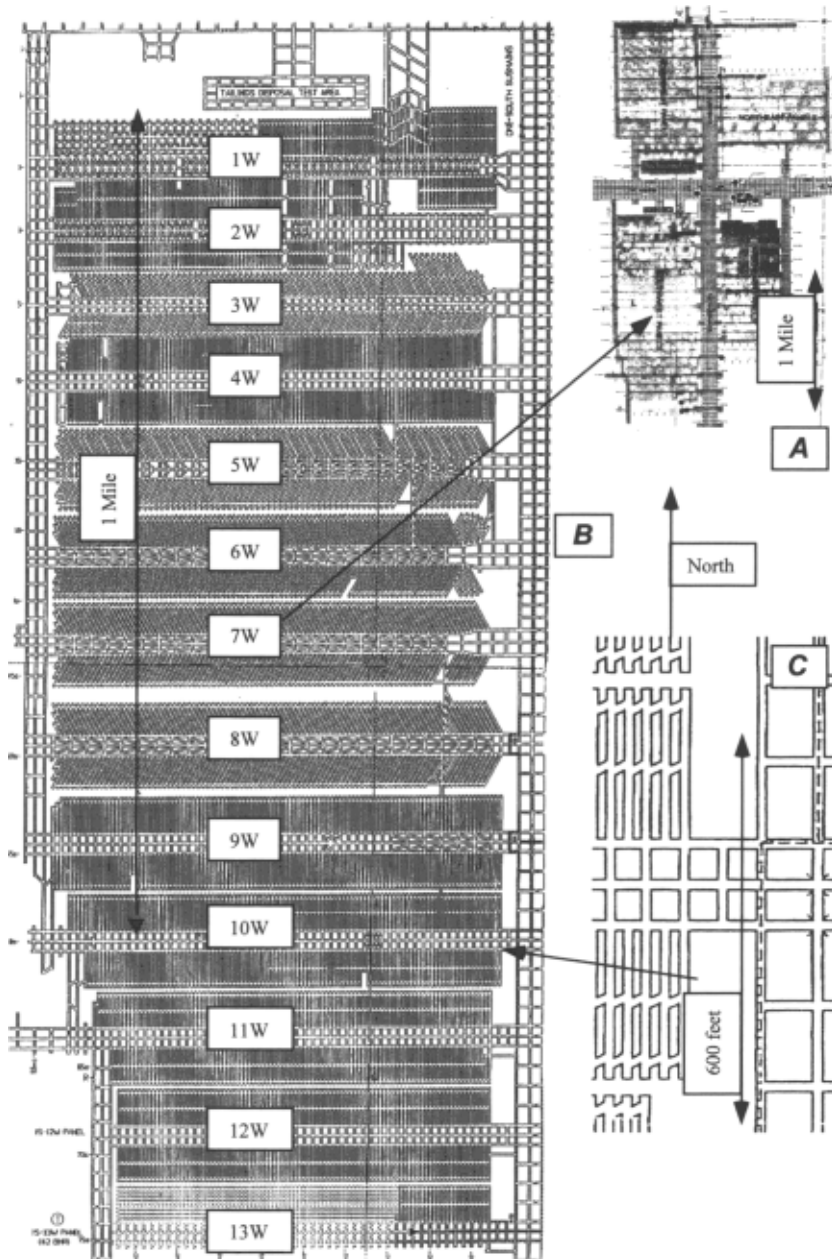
A, Overall layout for part of mine; B, layout of southwest panels that collapsed; C, details of typical panel (MSHA, 1996).
